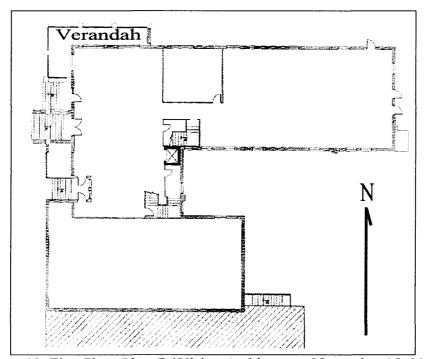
First Floor Plan (In\Vision Architecture, November 15, 2004)
